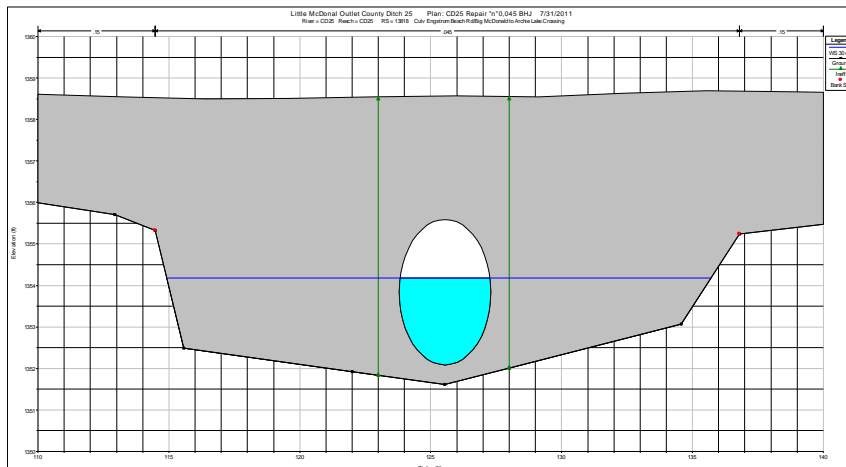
CD25 Cross Section at Engstrom Beach Road—Culvert is Part Full at Big Mc OHW
